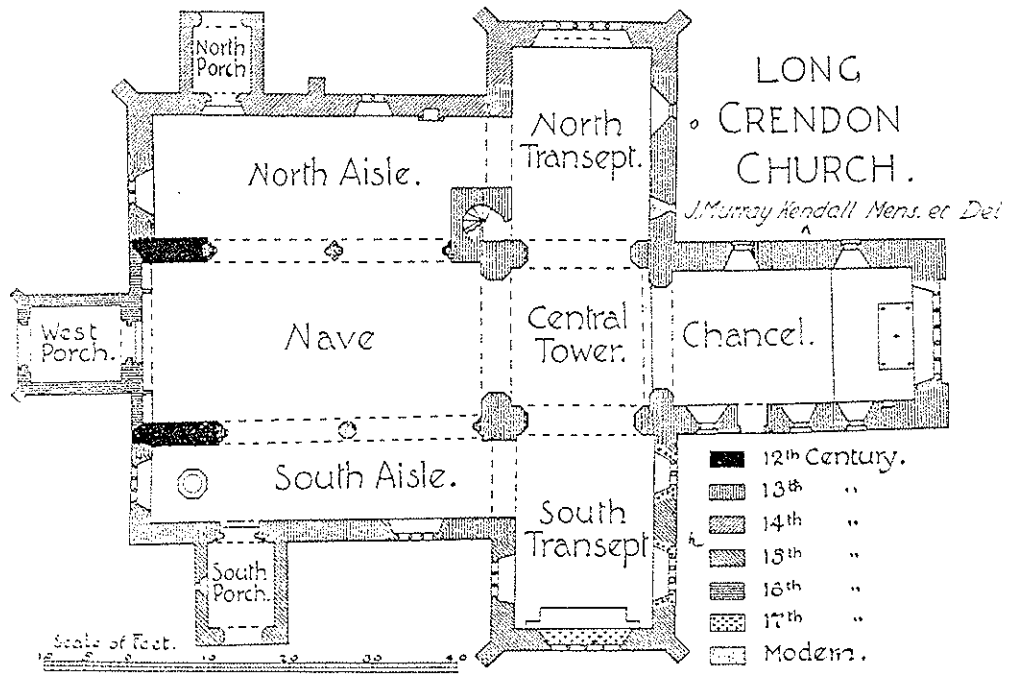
Plan of St Mary the Virgin, Long Crendon (from RCHM plan, 1912)
